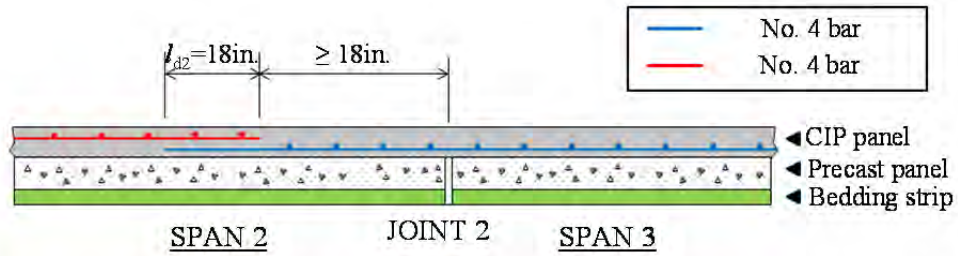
Section showing details of longitudinal splices, Wharton-Weems Overpass (Joint 2)
